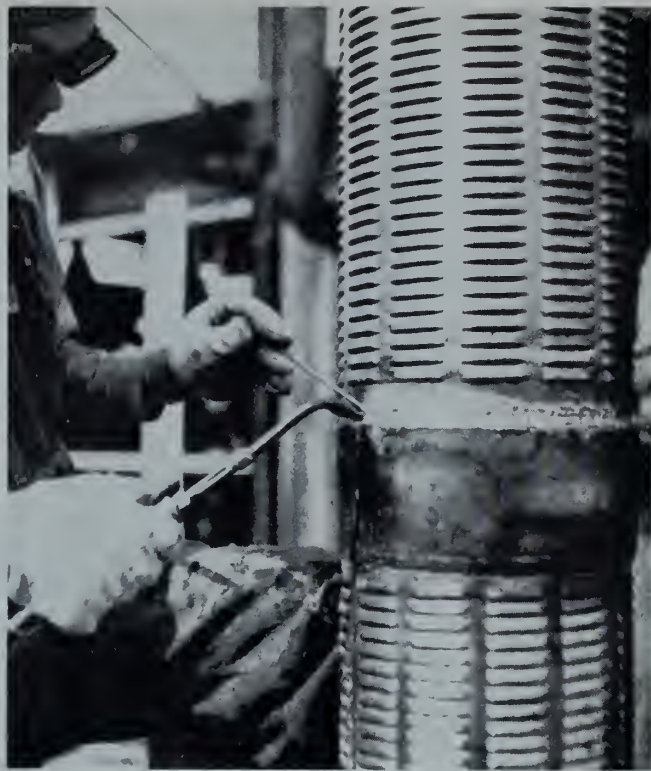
Field welding joints of 12-in. bronze shutter screen as it is being installed in well.
